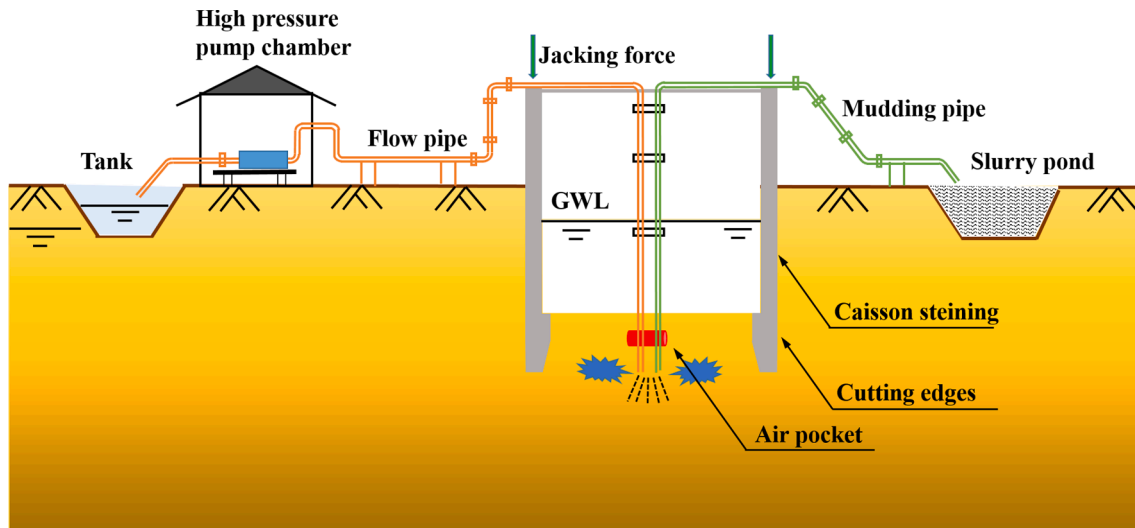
Operation mechanisms of the excavation in undrained soils using new open caisson installation technology.
